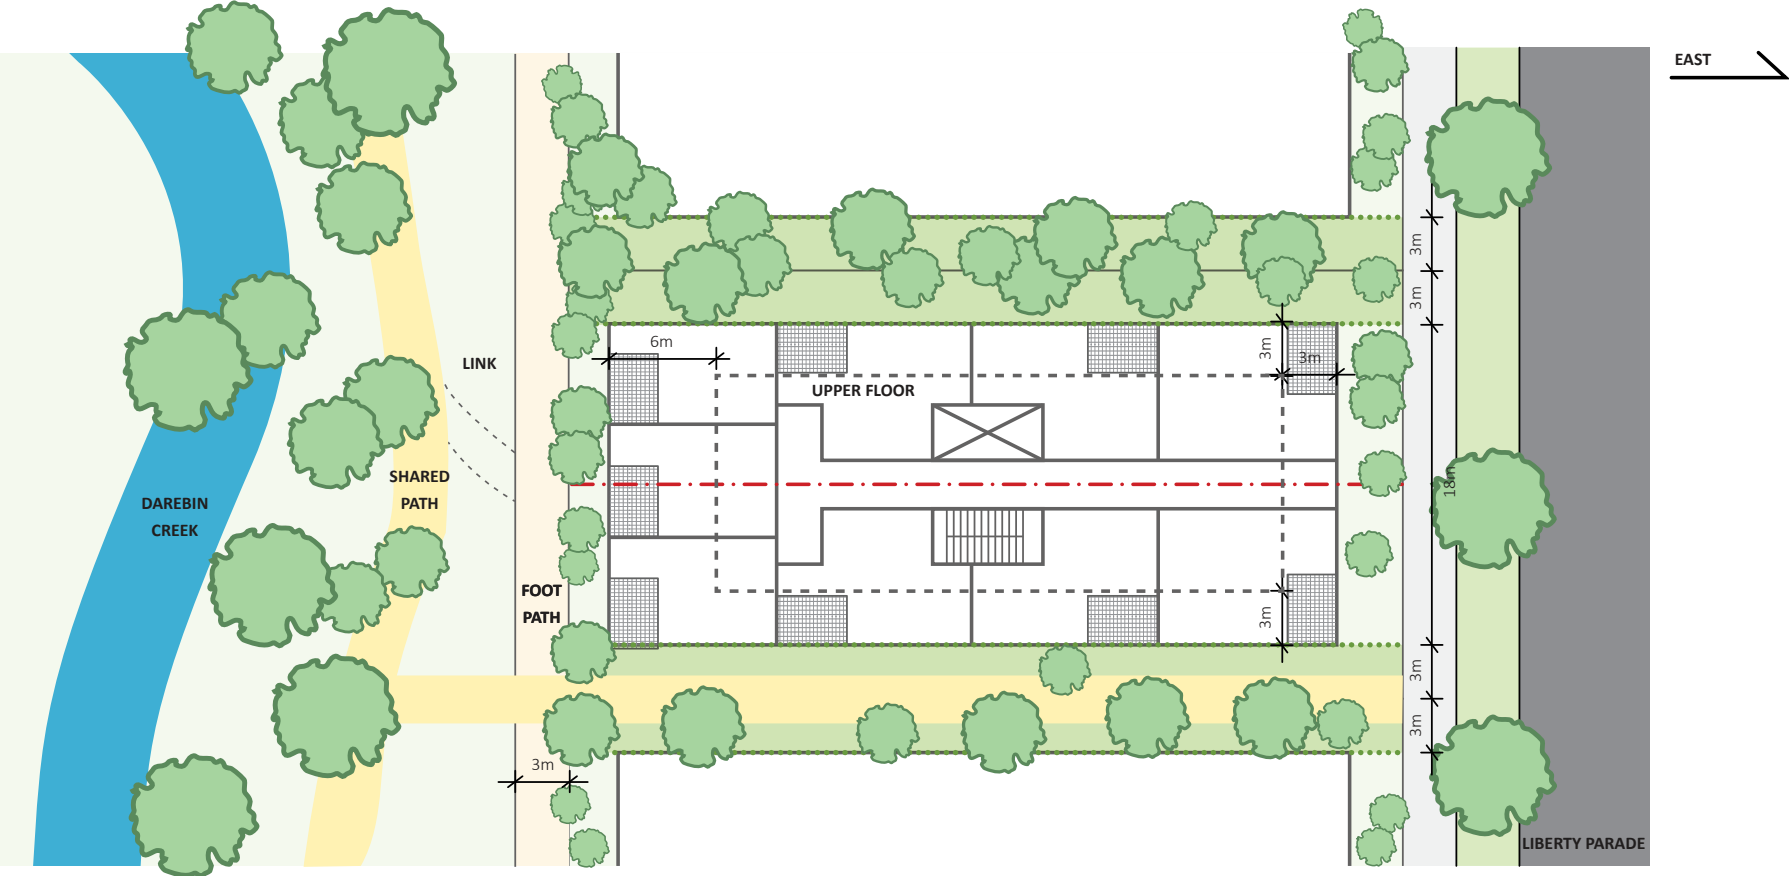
Typical Upper Floor Plan - Creekside (two lots consolidated)
